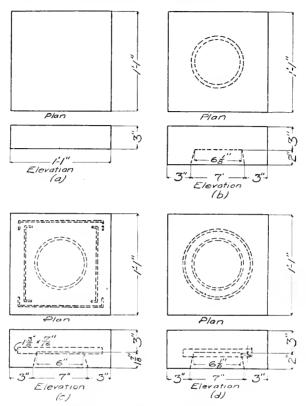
Forms of Shear Test Piece. (a) Plain Concrete Plate. (b) Recessed Block. (c) and (d) Reinforced Recessed Blocks.
